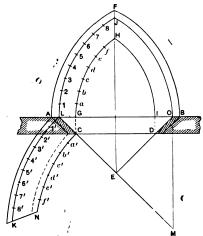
An Opening in a Straight Wall with Splayed Jambs and Pointed Soffit.
